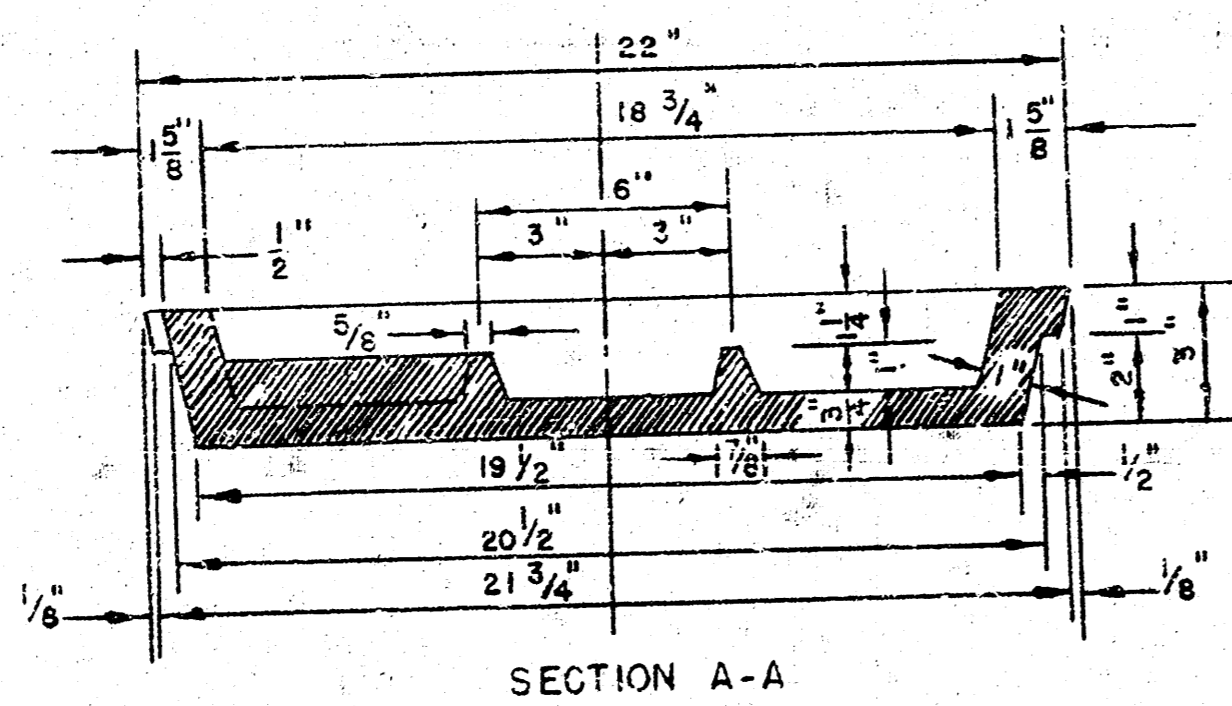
DETAIL OF DROP STACK FOR EXISTING MANHOLES IN GROUND WATER
